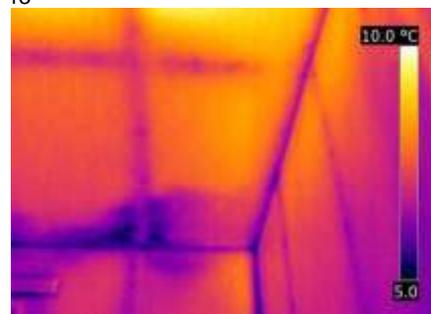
Internal IR image wall corner and ceiling junction plot 14
